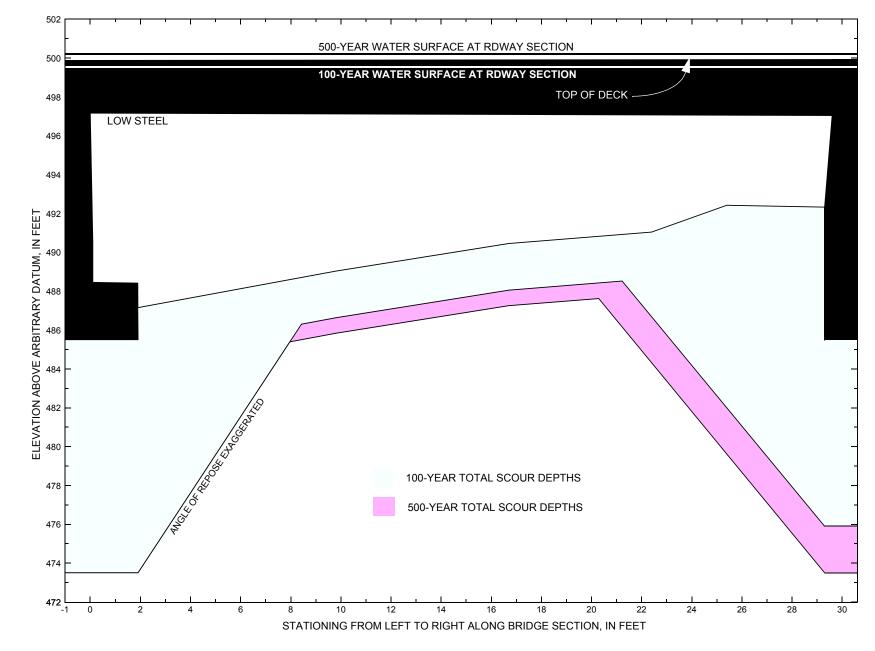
Scour elevations for the 100- and 500-year discharges at structure LOWETH00020009 on Town Highway 2, crossing East Branch Missisquoi River, Lowell, Vermont.
